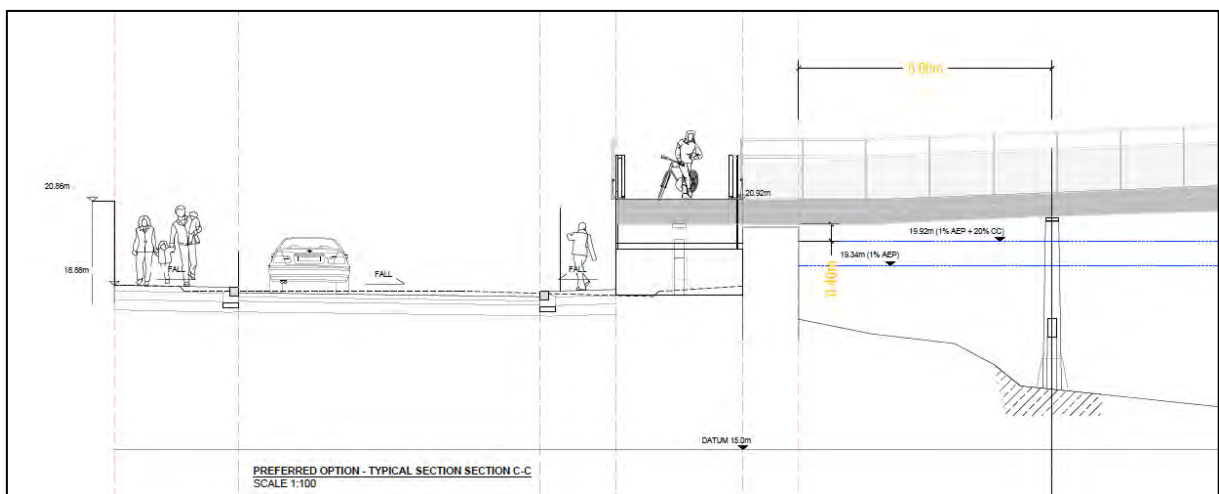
Southern bridge crossing landing in Raheen Road elevation
